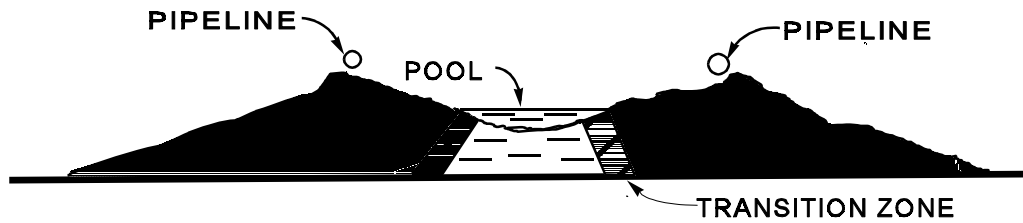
Cross section of a hydraulic fill dike during construction.
